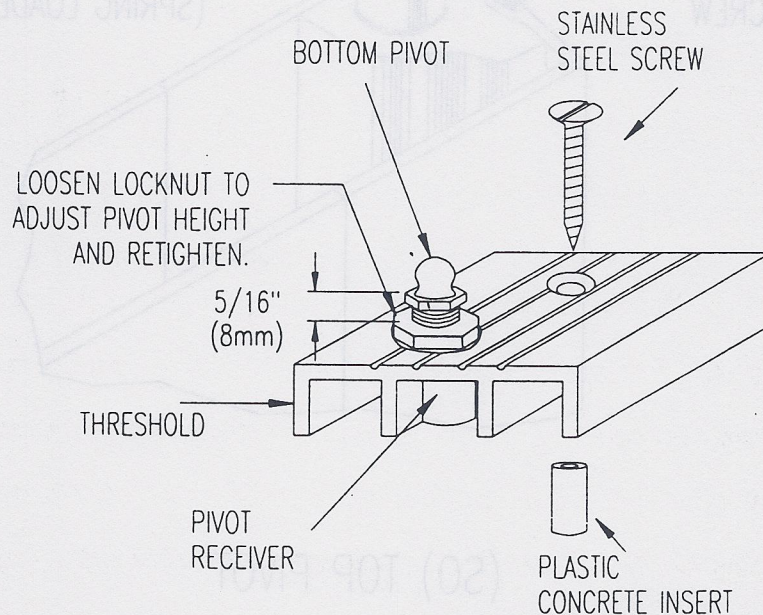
Installation of Bottom Guide Track, Panel Threshold.
